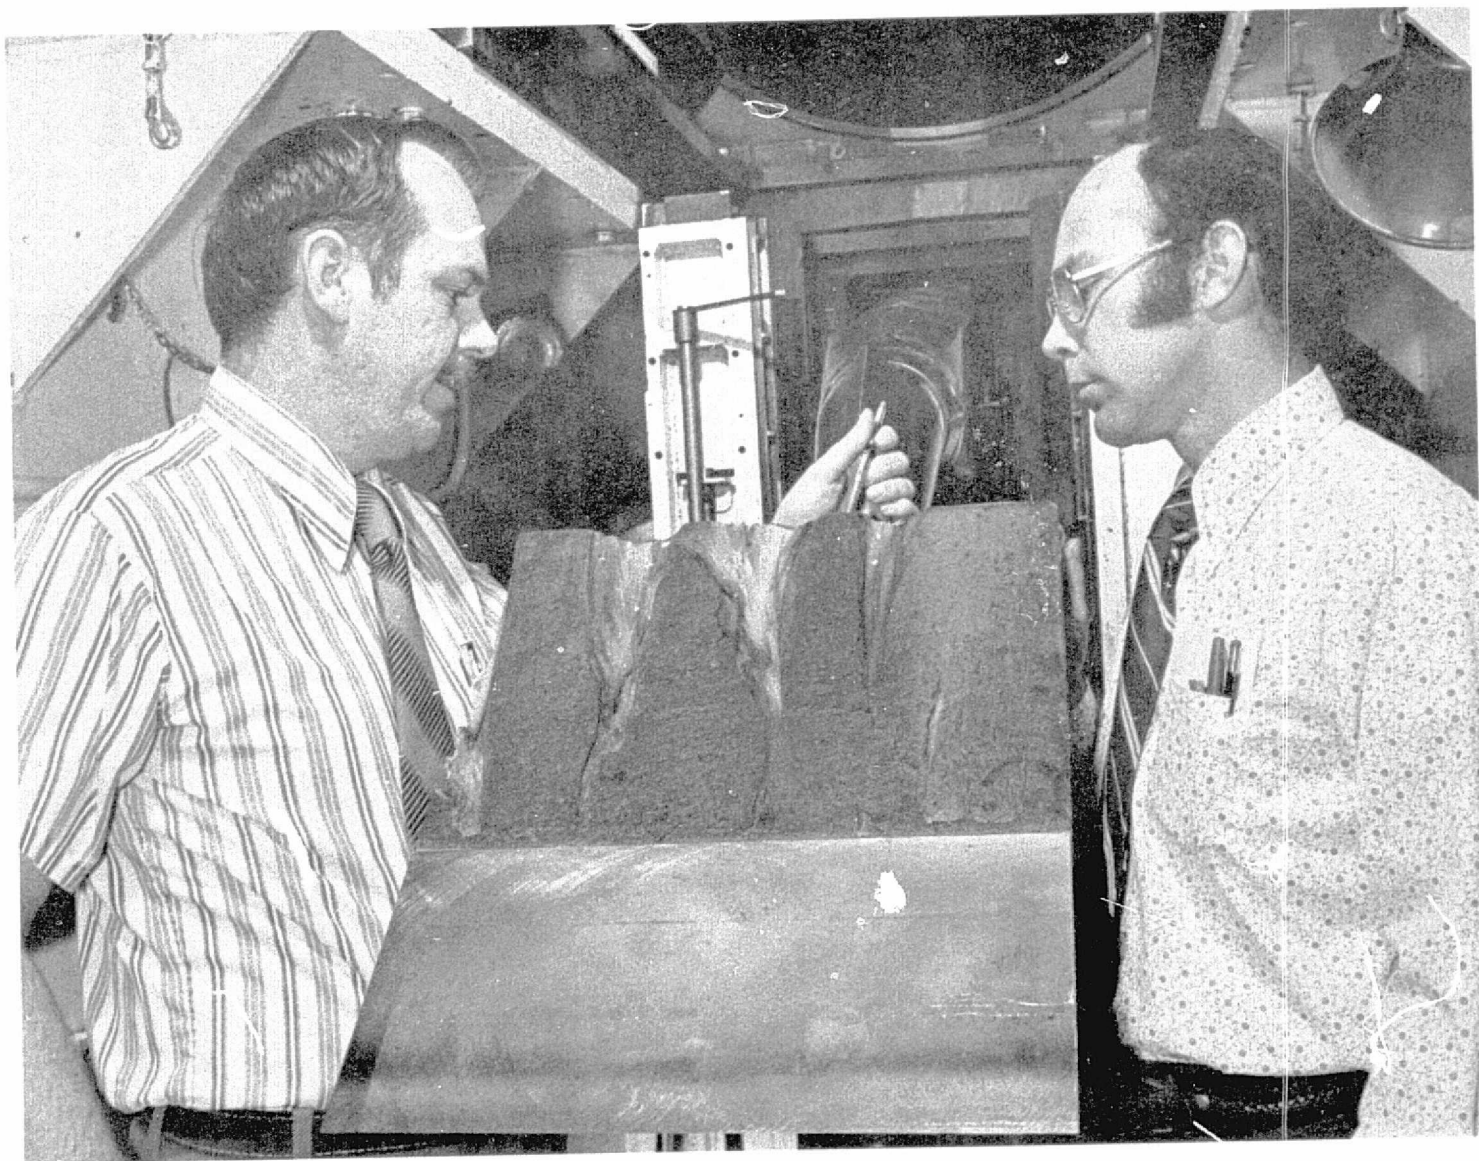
Typical Post-Test Panel in Tunnel C Test Tank Before Detaching from Wedge Fixture
